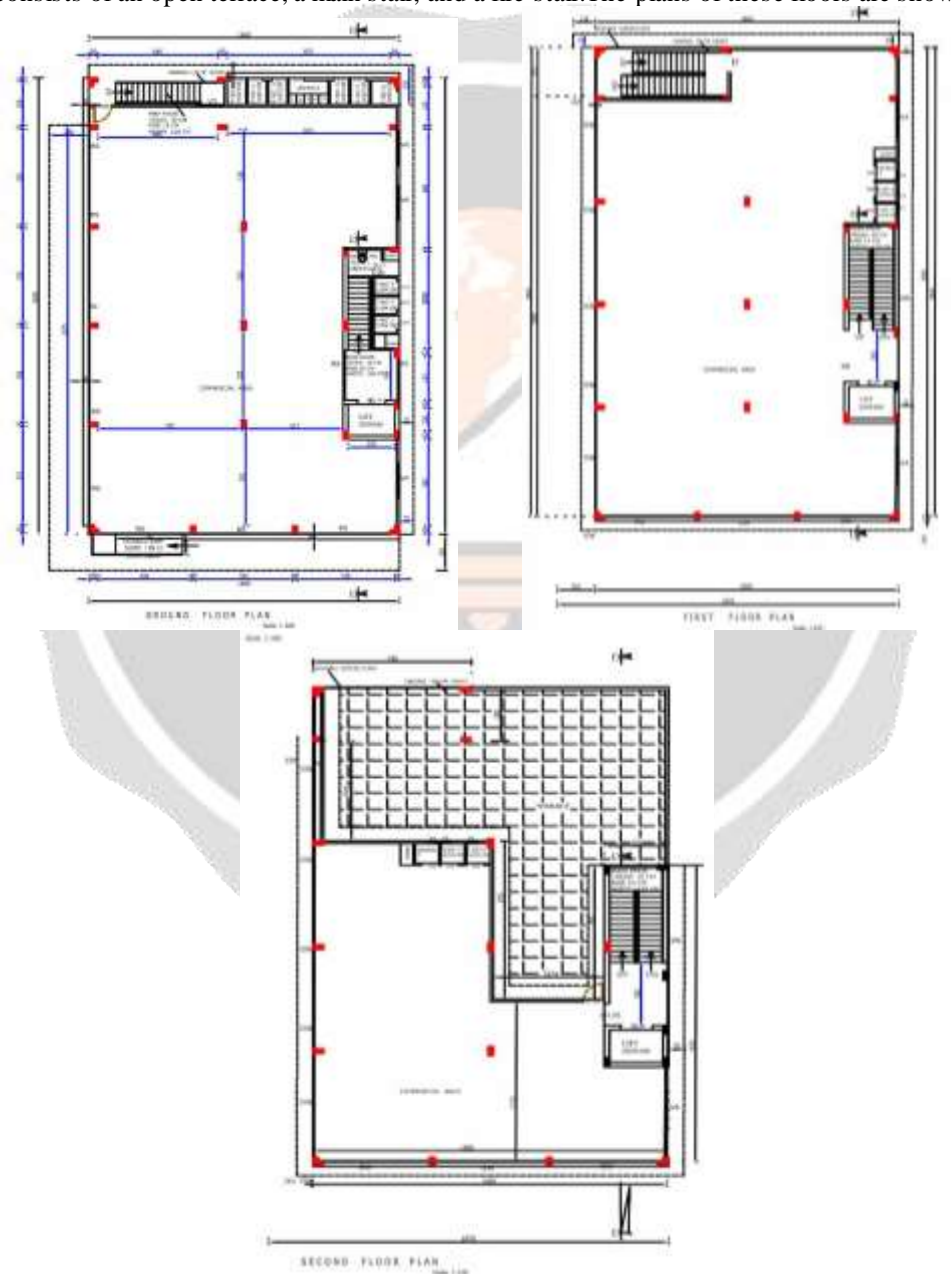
Floor plans of (a) Ground floor (b) First floor (c) Second floor
